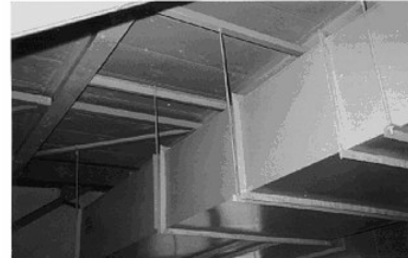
El Centro Steam Plant, 1979 Imperial Valley Earthquake. Trapeze Rod-Hung Rectangular Duct with Close Up of the Trapeze Detail
